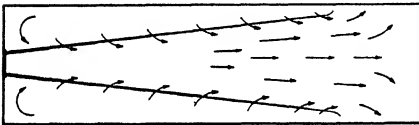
PLAN VIEW LONG THROW SUPPLY OUTLET
